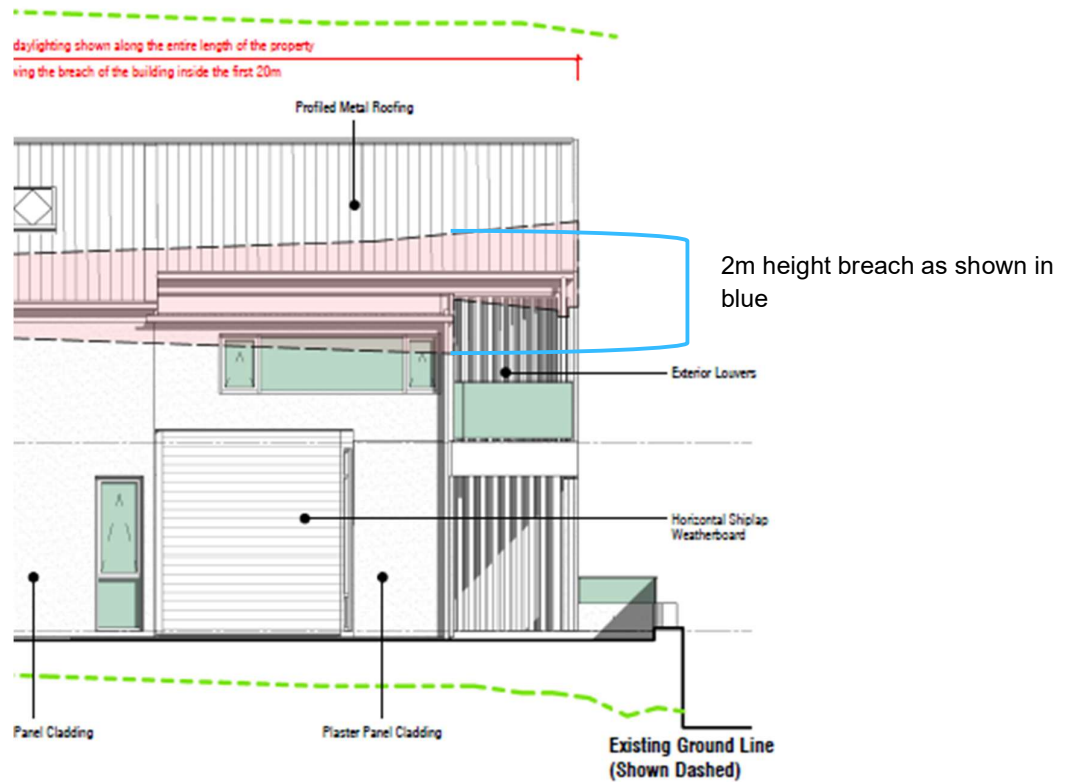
Inset View of elevation of Boon drawing SK3 illustrating location of 2m high breach in elevation marked in blue.
